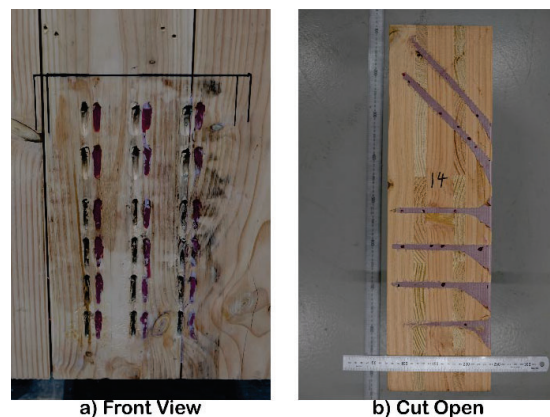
Picture of repaired S1-DF-2-R connection post testing a) View from front of connection after steel bracket is removed b) Section cut through the epoxy repair
